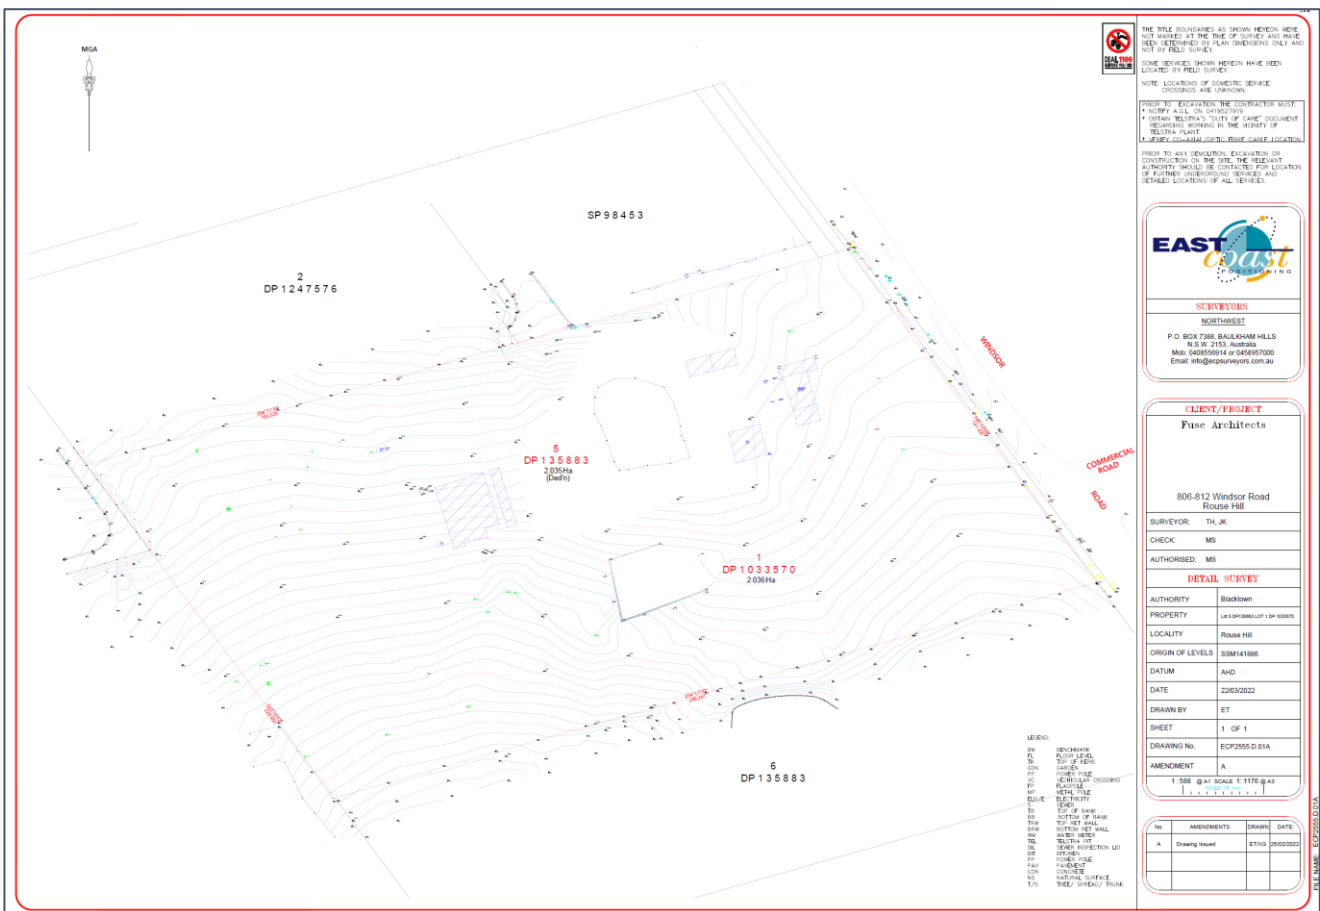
Survey plan (Source: East Coast Positioning Surveyors)
